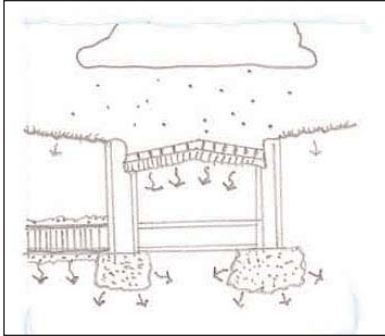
(above). Depiction shows infiltration from permeable pavement, dry well inlets, and permeable pipes. See Appendix A for details.
